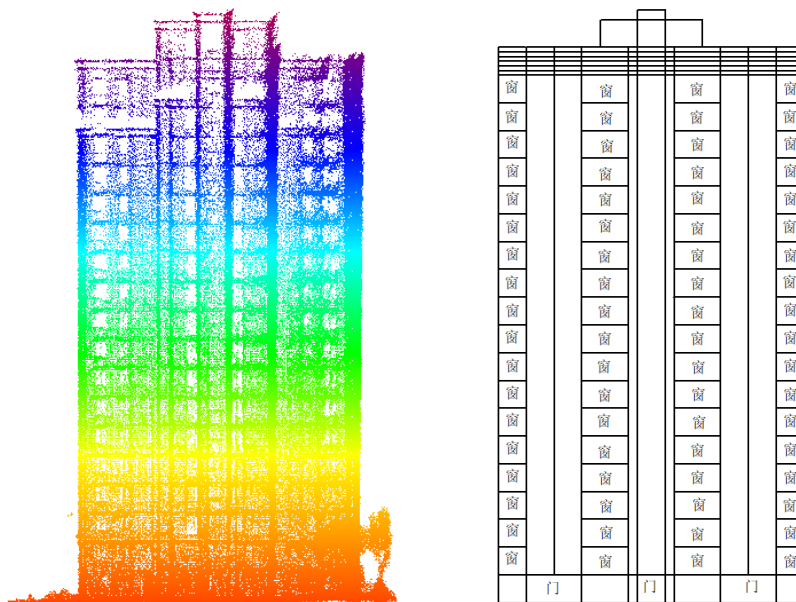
Drawing results of point cloud elevation section and elevation of a building
